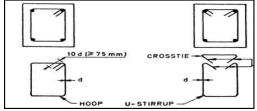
Beam web reinforcement as per IS13920 (2002)
